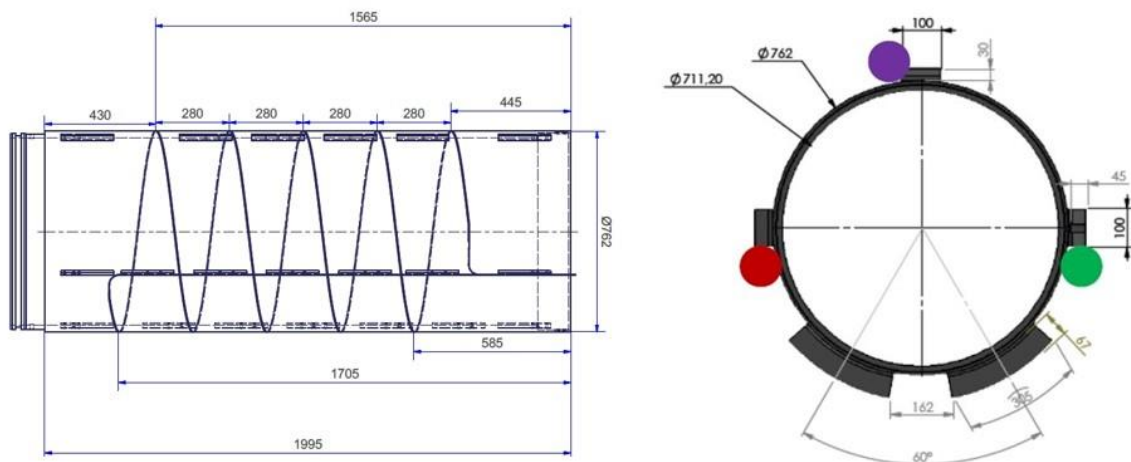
Cross-sections of the ALC1605 demonstrator tubing, illustrating the different geometrical arrangements of the optical fibre systems. Left: spiral arrangement along the axis of the tubing. Right: three longitudinal optical fibres (red, blue and green) along the axis of the tubing [3].
